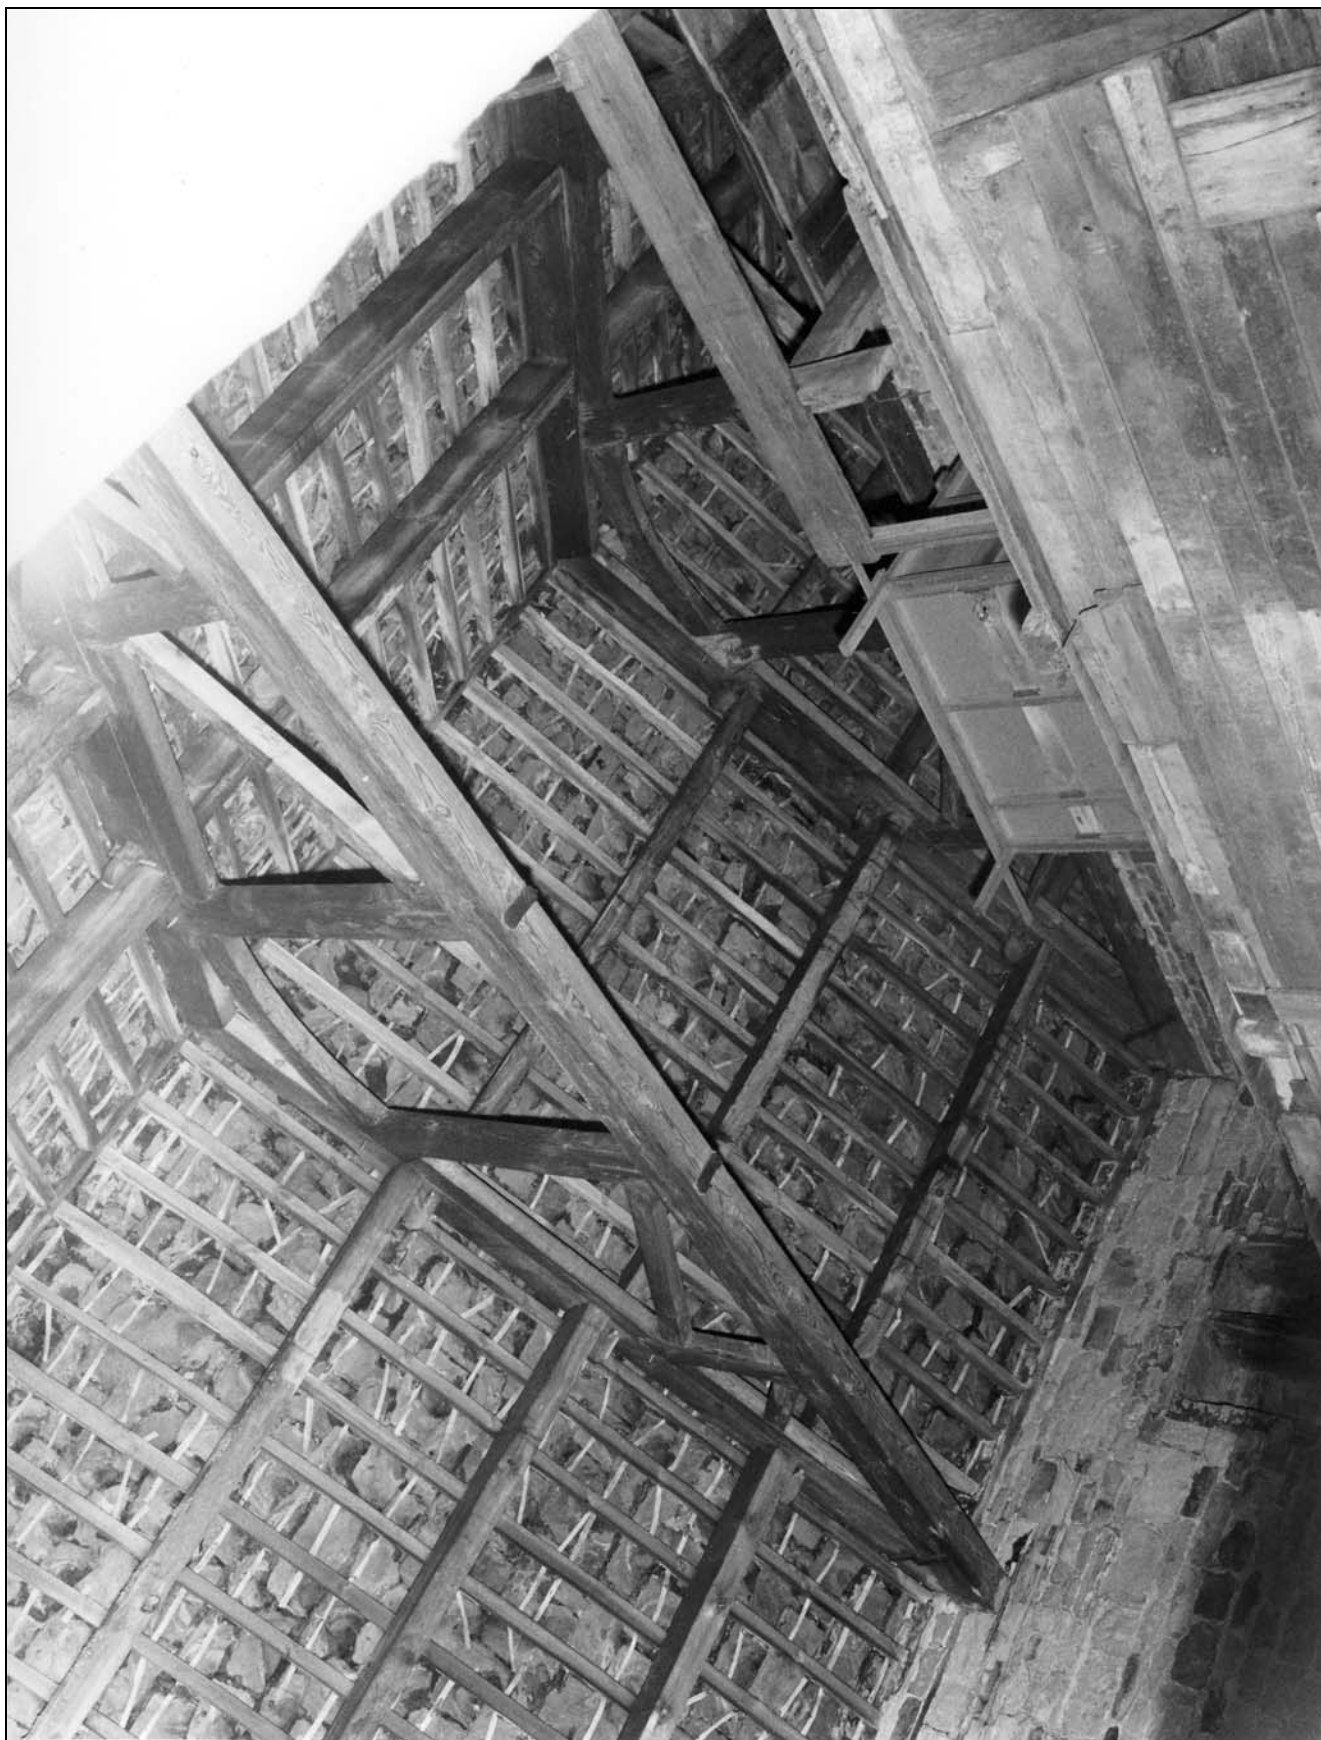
Underside of roof, from the south-west (film 3, frame 1)
